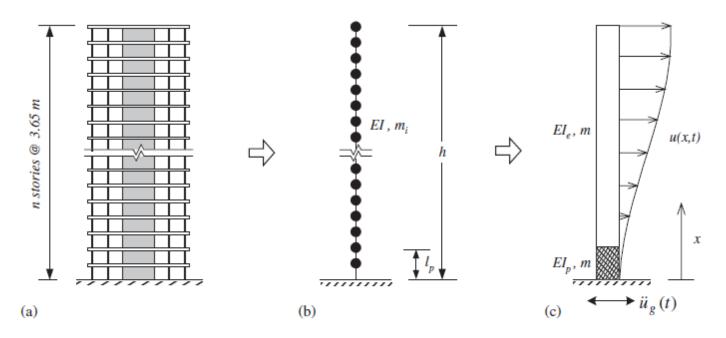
(a) Wall building of interest; (b) simplified inelastic wall model; and (c) equivalent linear wall model.
